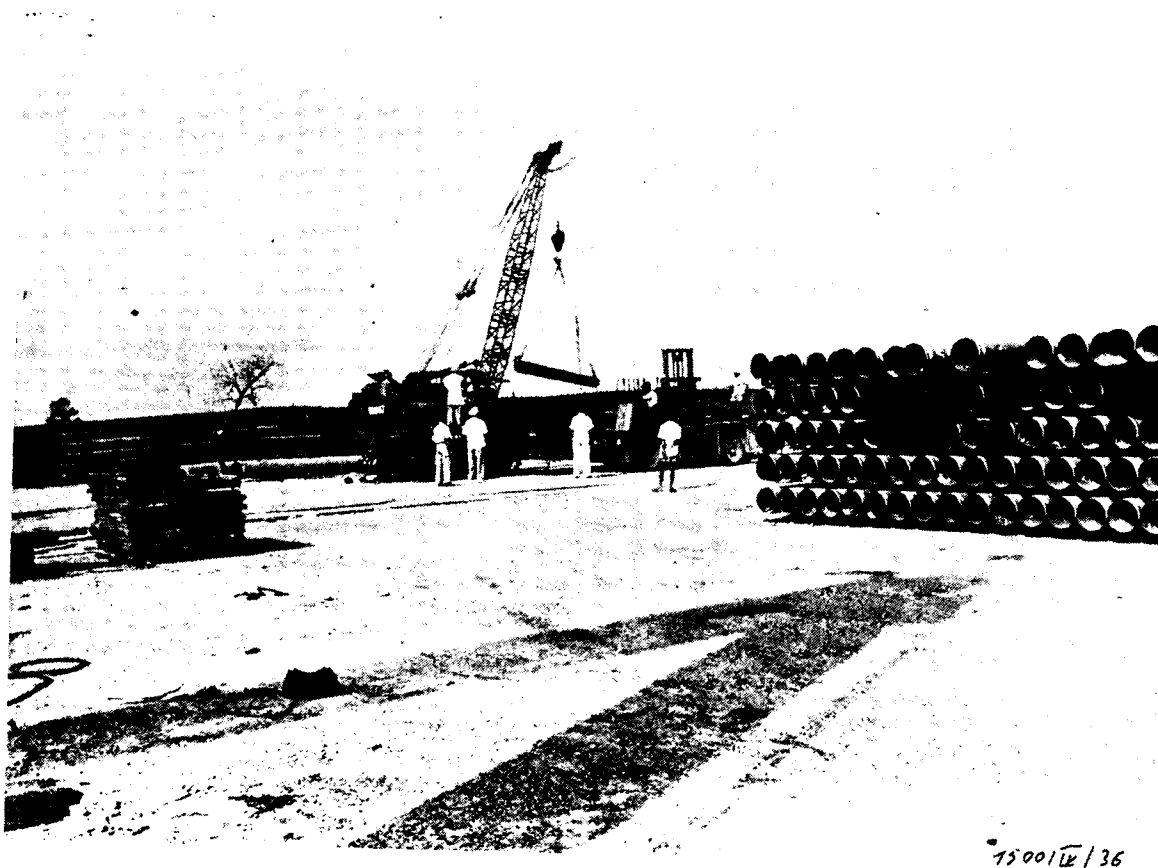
Loading of tubes for the Assam - Barauni petroleum pipe line.
